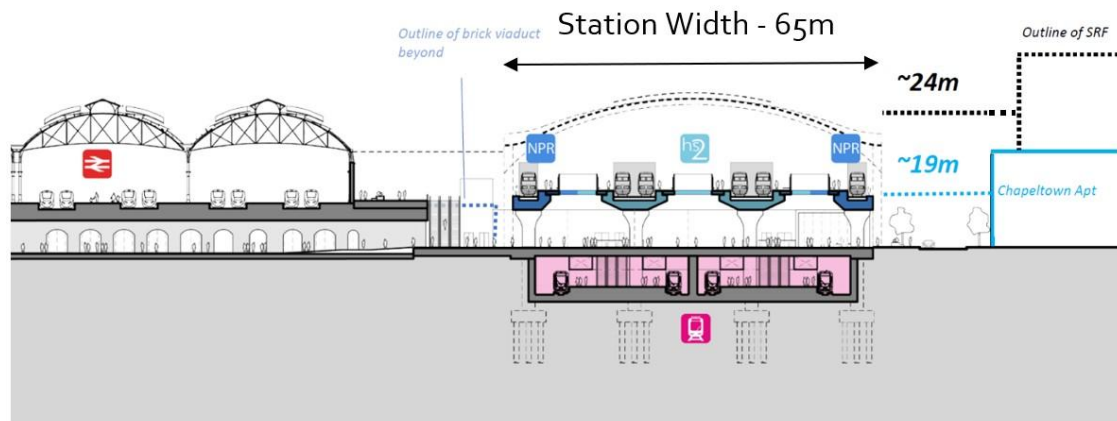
Conceptual Section of Manchester Piccadilly Baseline Proposal
